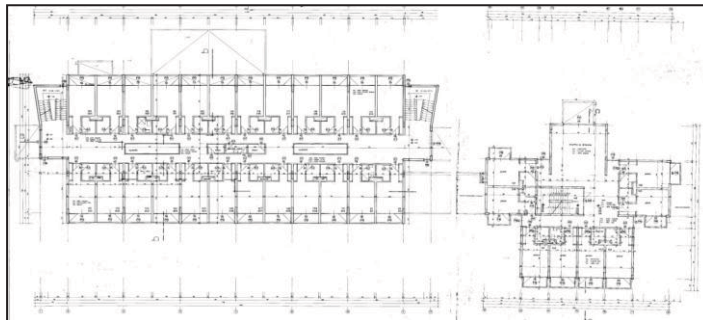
Floor Plan Layout of Guesthouse (Source: İSDEMİR Archive, 2012)
